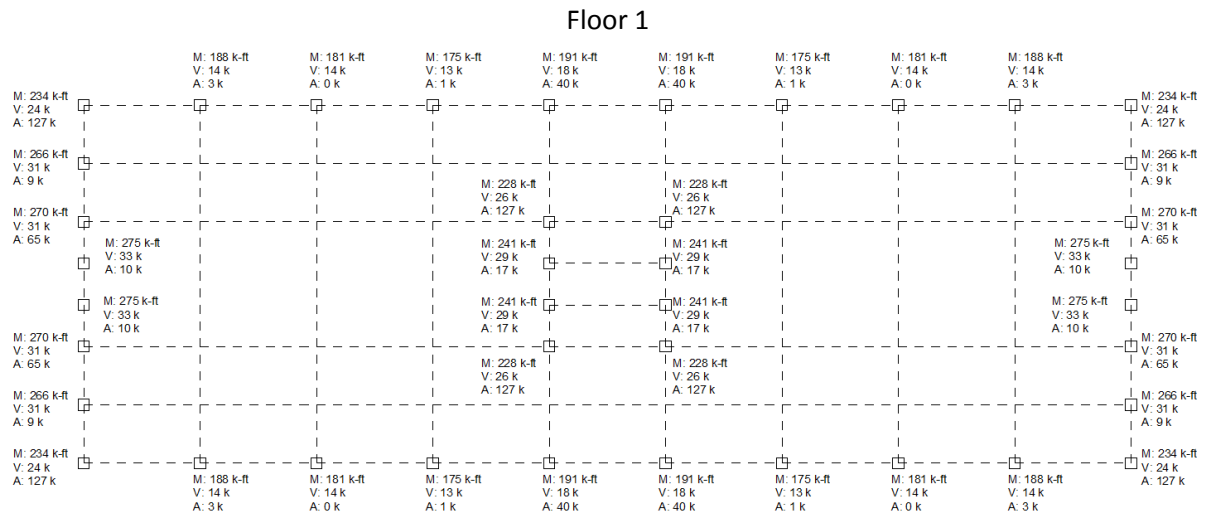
Maximum forces in the first floor columns due to tsunami base shear
